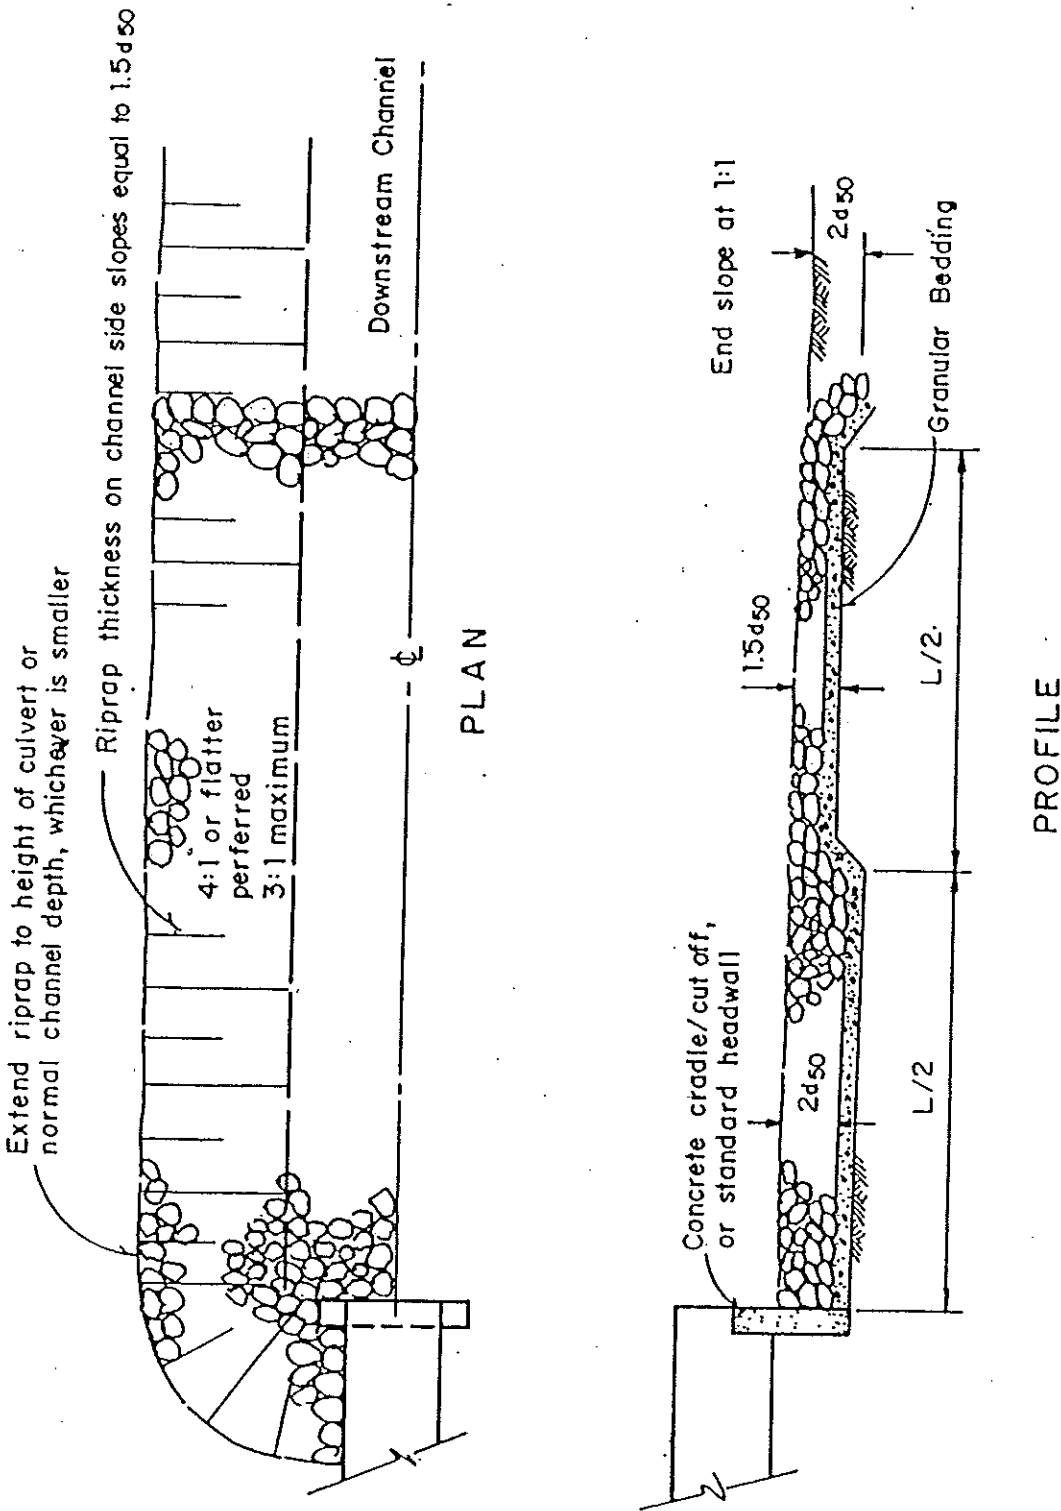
CONDUIT OUTLET EROSION PROTECTION
